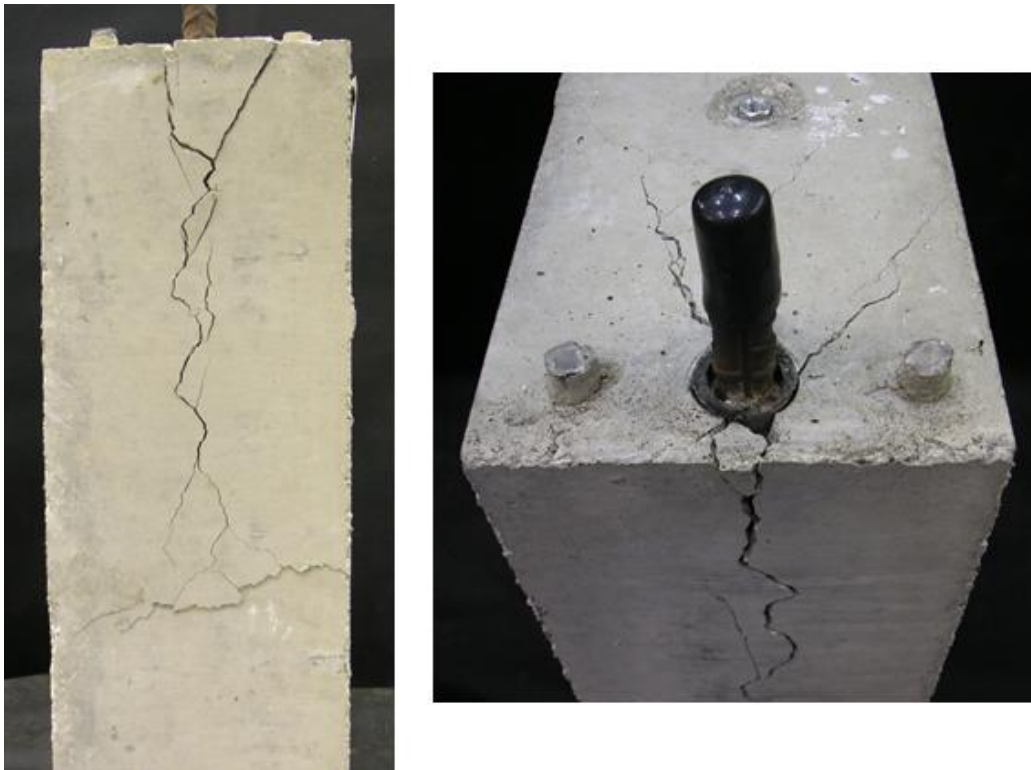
Typical splitting failure for beam-end specimens (BE-RAC2-50-375B)
